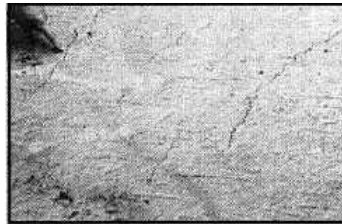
Plastic shrinkage cracking (Source: <http://www.cadman.com>)
